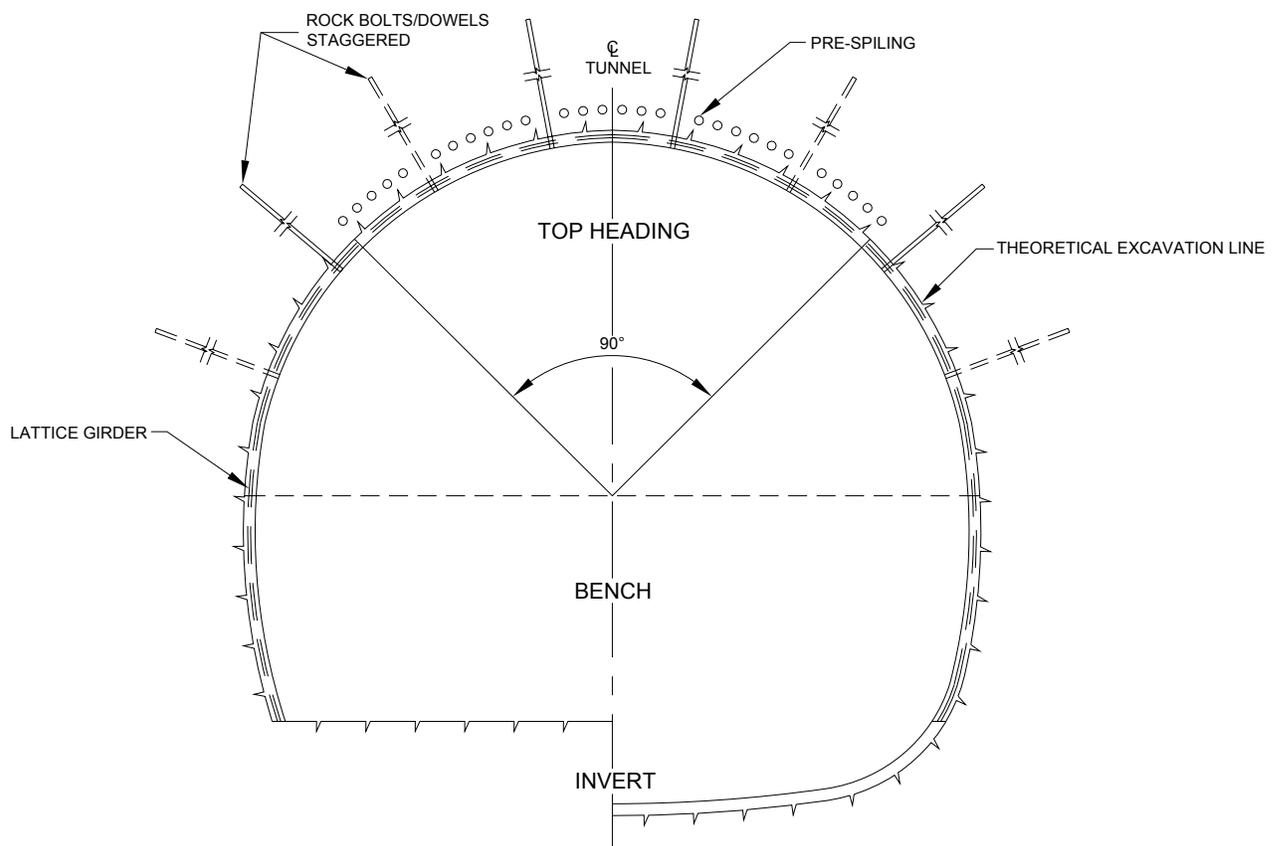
Prototypical Excavation Support Class (ESC) Cross Section
